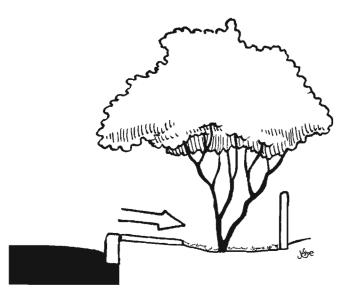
B. Sidewalk wisely sloped to drain its runoff to adjoining tree basin. Slope sidewalk at least 1/8 inch (3 mm) per linear foot (30 cm), but never more than 1/4 inch (6 mm) per foot.
